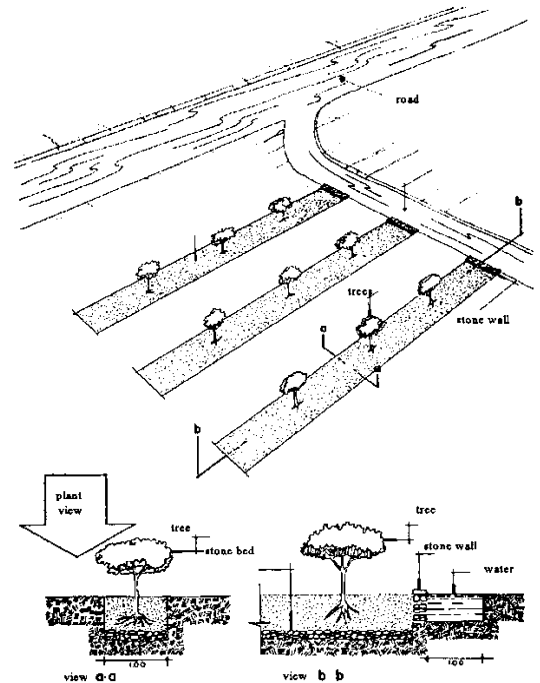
Shawn Runoff collection from paved and unpaved roads mechanism
